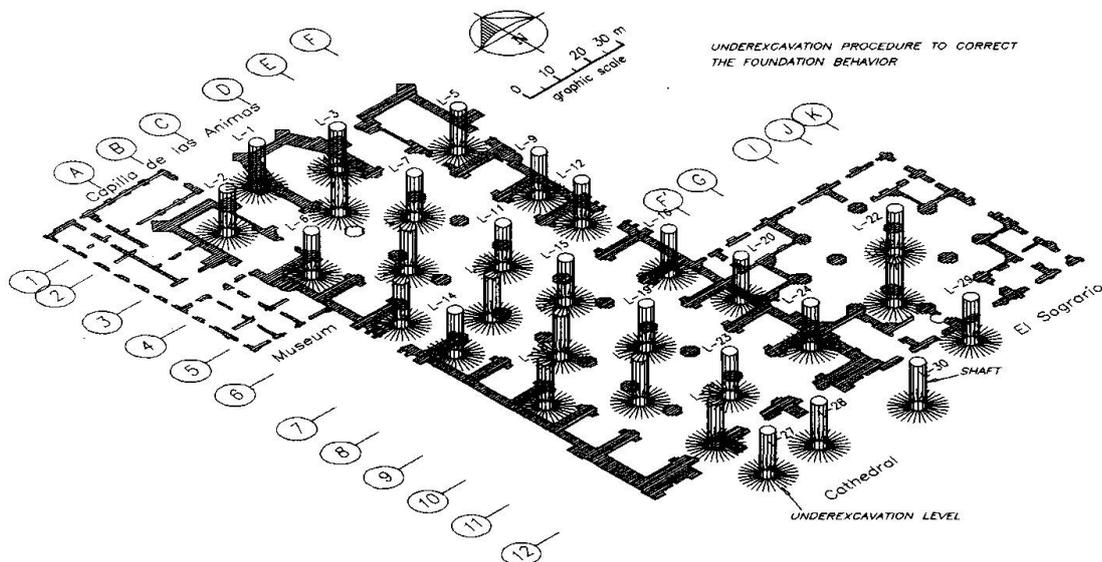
SHAFT AND RADIAL UNDEREXCAVATION BORINGS LOCATION
